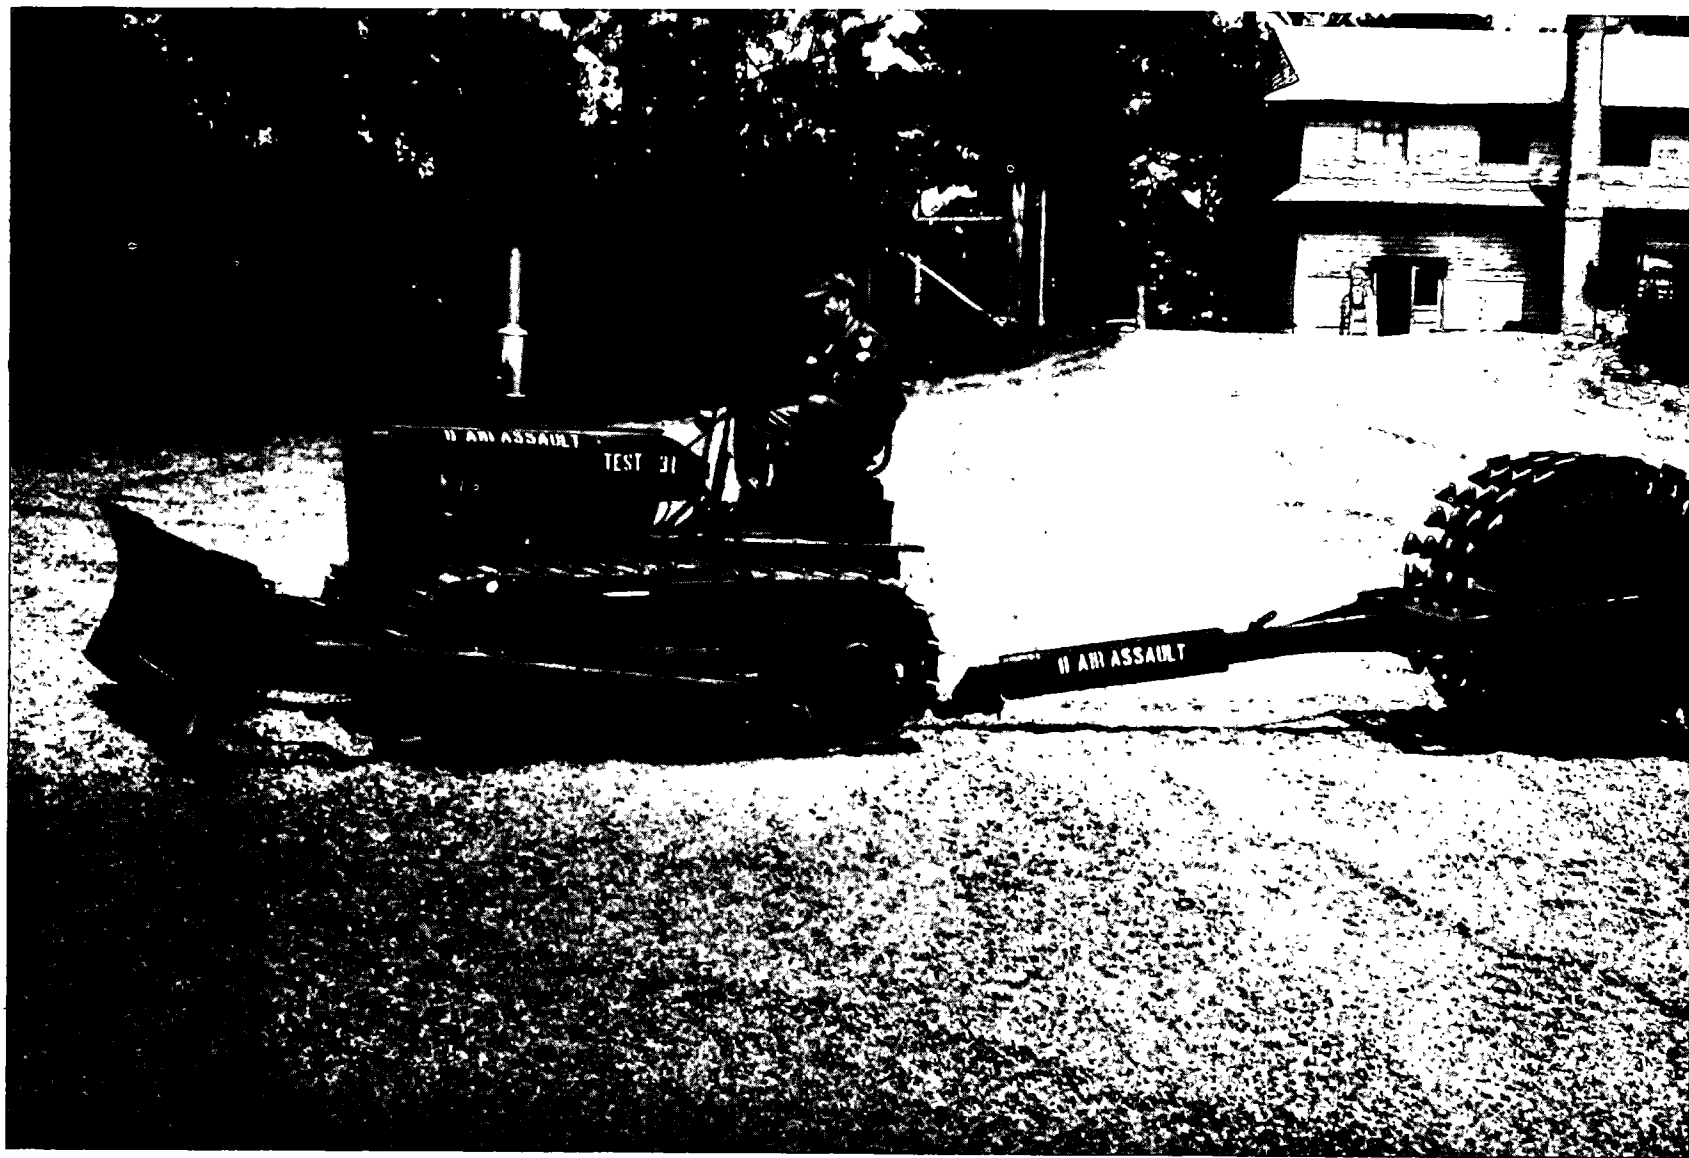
Helicopter transportable tractor towing single-drum sheepfoot roller.
